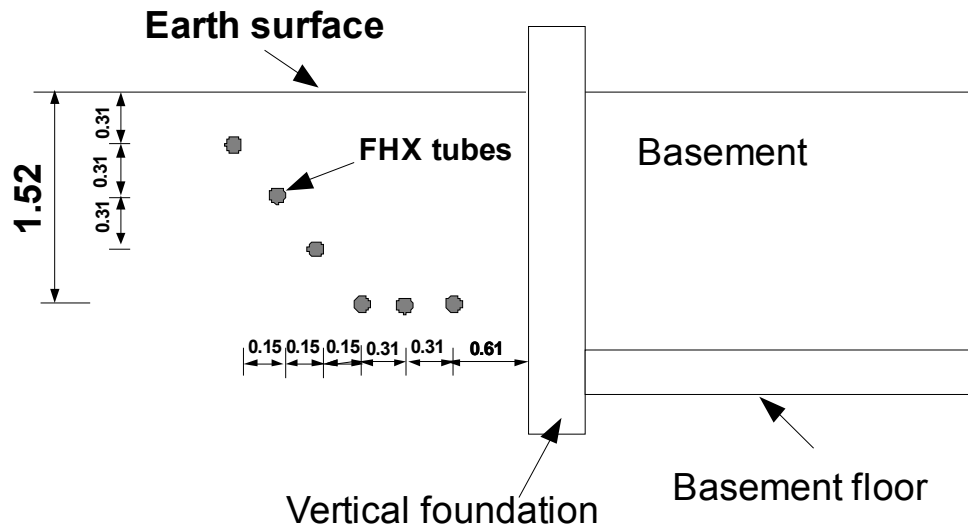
The geometry of FHX tubes: dimensions given in m
